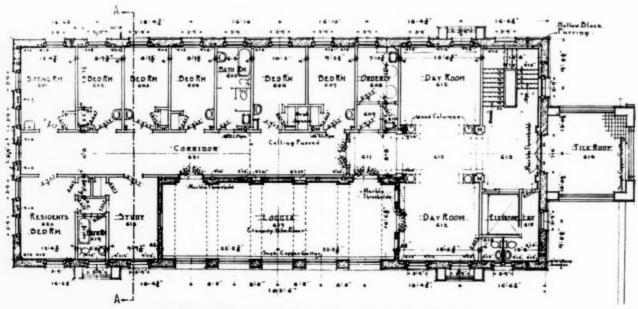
James Buchanan Brady Urological Institute-Sixth story plan.
